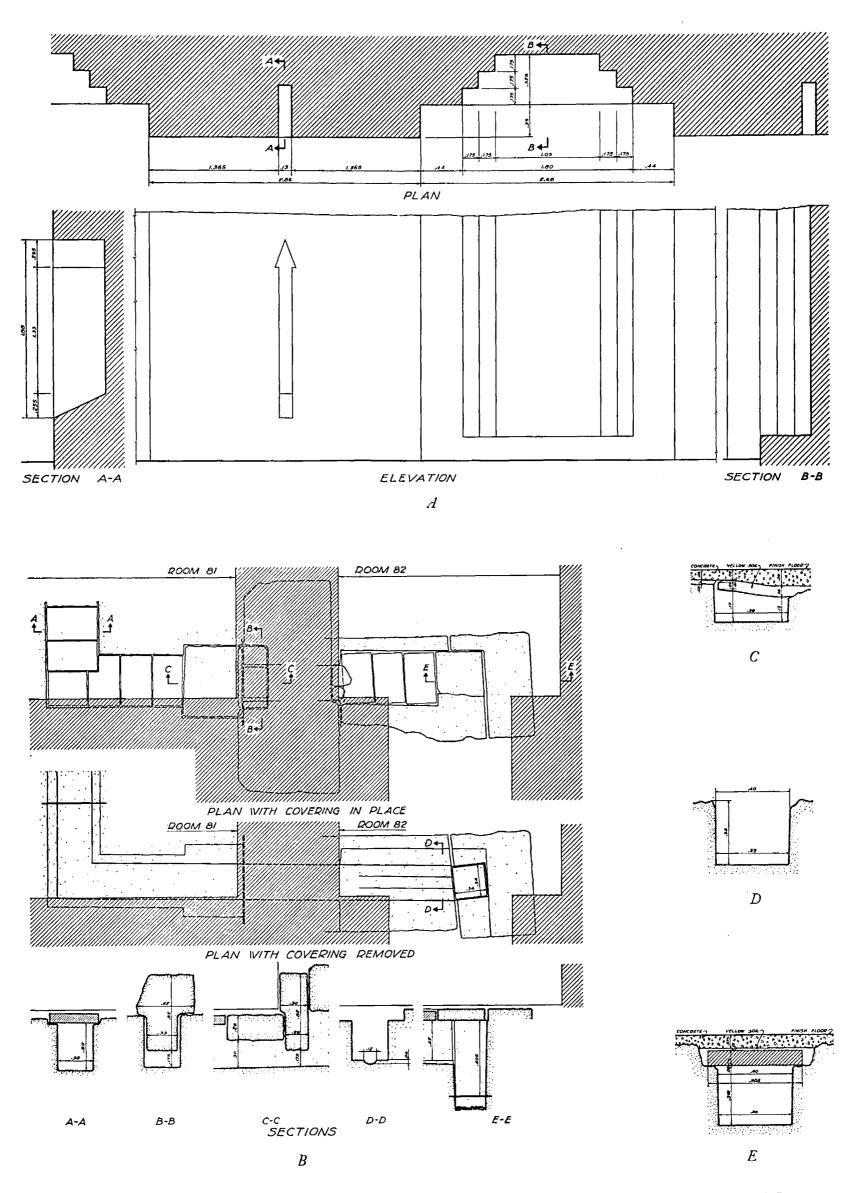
Treasury. Diagrams of Details. A. Niches and Slots in Exterior Wall. B. Canal and Floor Drain in Rooms 81–82. C. Drainage Canal in Northern Part of Room 70. D. Canal in Courtyard 29. E. Canal in Room 78 Scales, 1:40 (A-B) and 1:20 (C-E)
